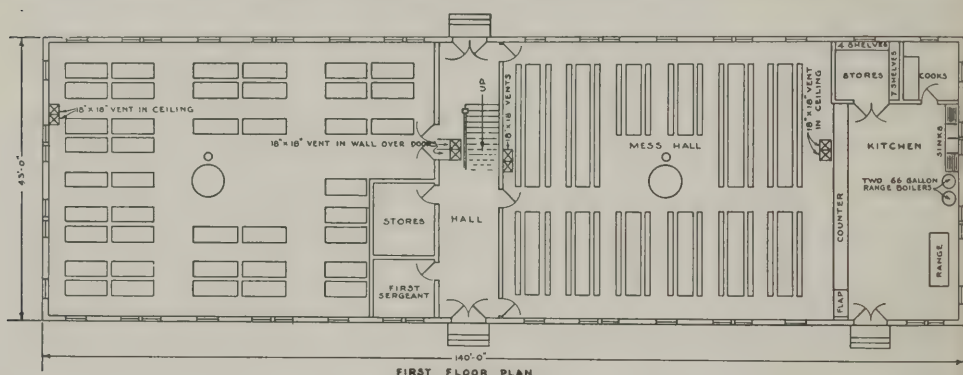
Same as Figure 9, showing first-floor arrangement
